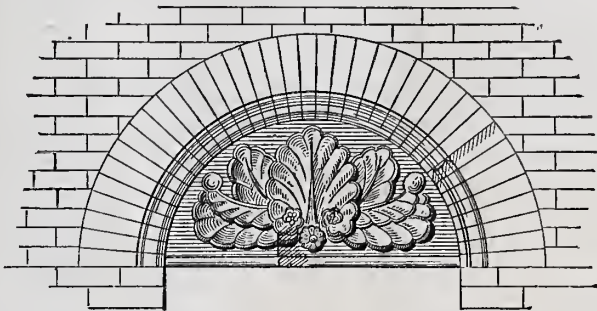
Arch in Second Story.—Scale, 1/2 Inch to the Foot. No. 98 Used Next to Terra Cotta Work.
